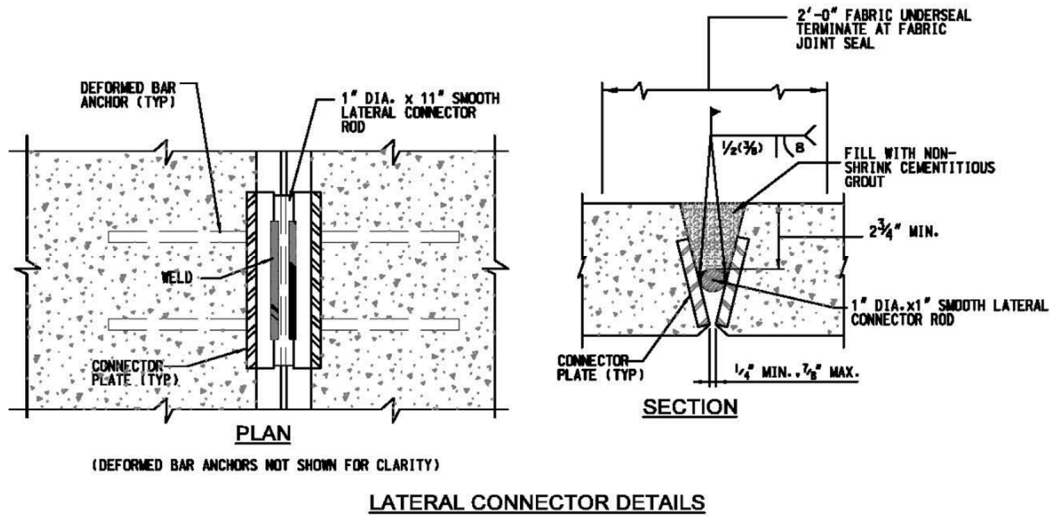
Connection detail for DBT bridge units. Obtained from (FHWA 2015)
